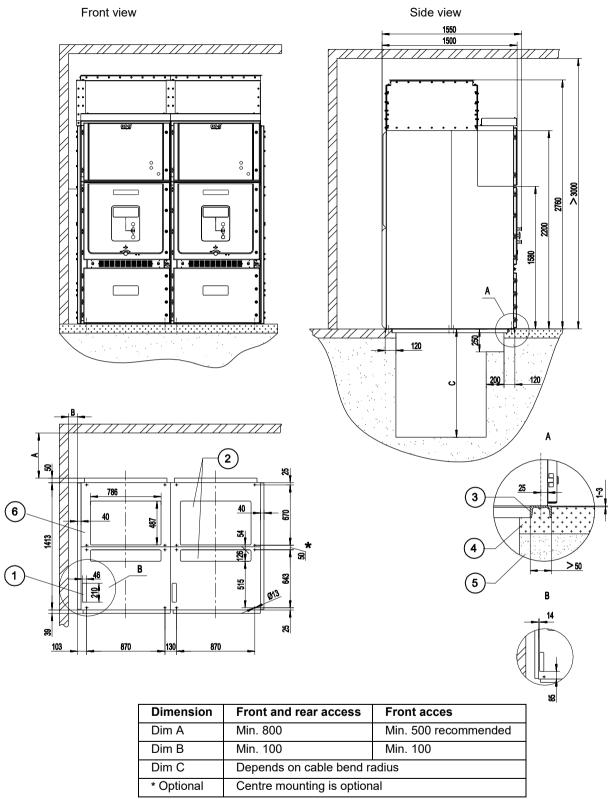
Basic floor plan for bottom cable entry panel rating 17.5kV 3150A 40/50kA
